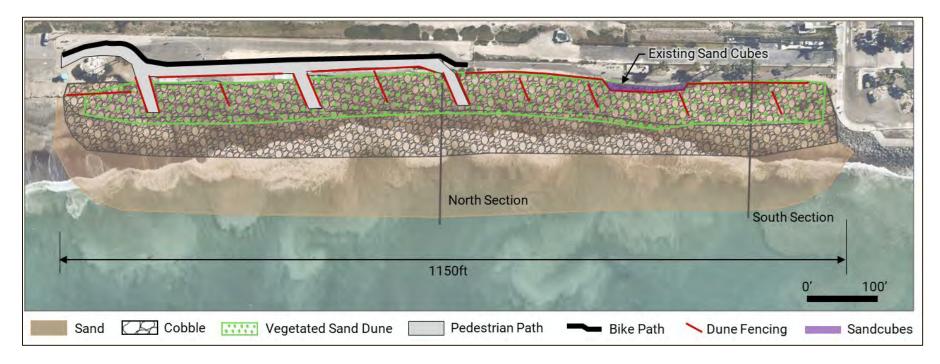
NORTH REACH COBBLE BERM AND VEGETATED SAND DUNE PILOT PROJECT - PLAN VIEW
